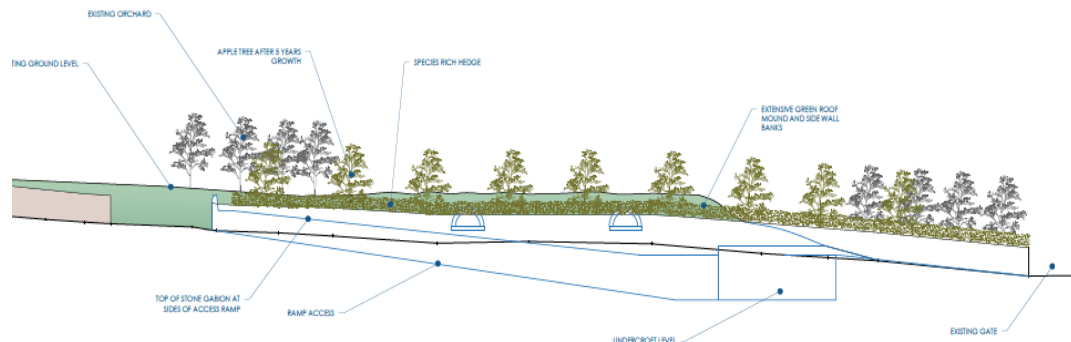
Proposed east elevation modelled to show how it would be experienced from the road © C02 Architects
